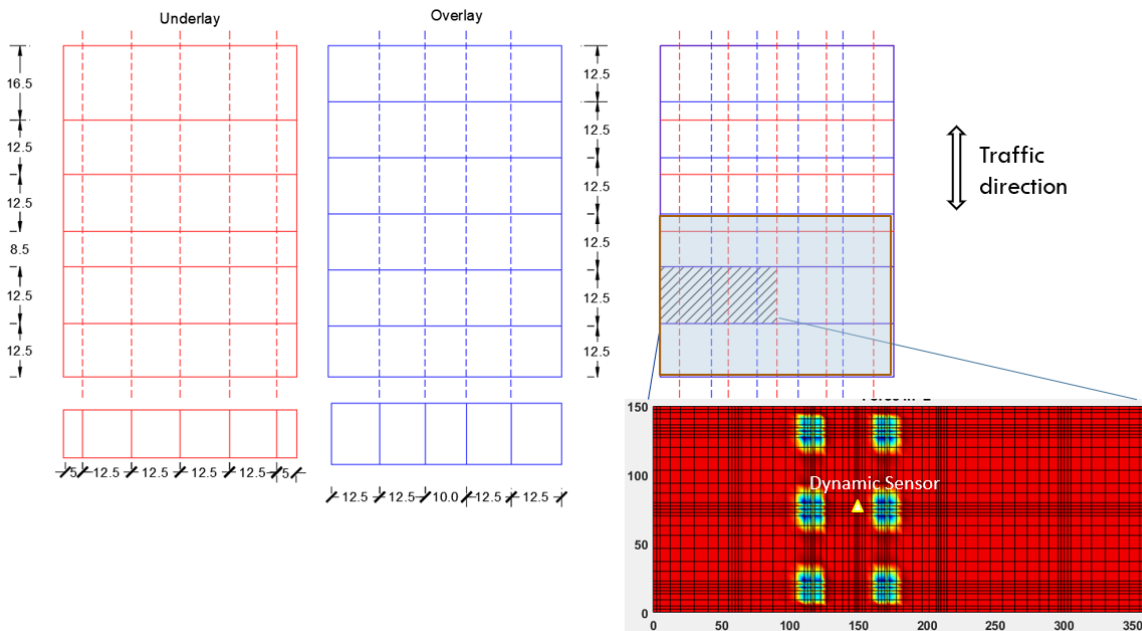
Overlay and Underlay Joint Arrangements and The Modeled Section of The Pavement
